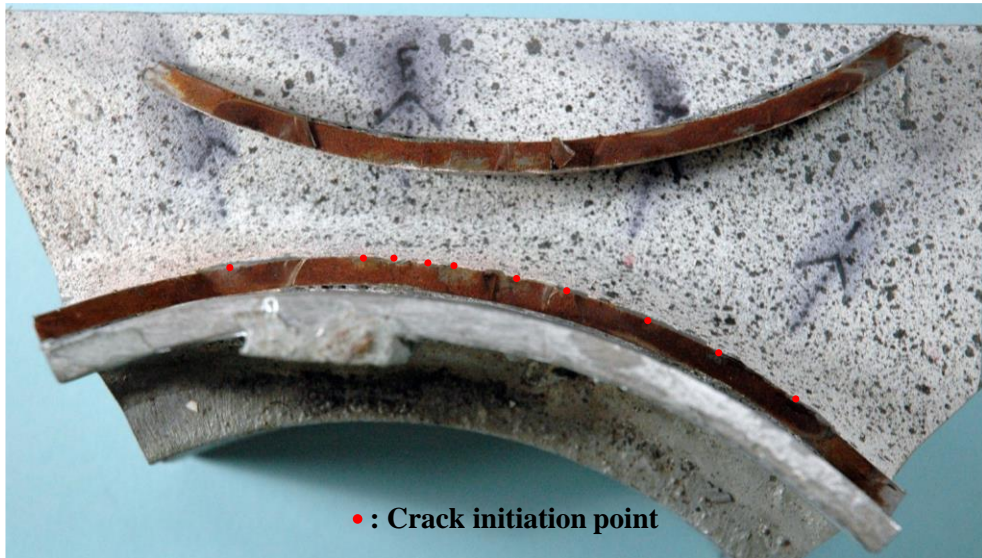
Fatigue fracture surface and identified crack initiation points in Type III-3 Arm
